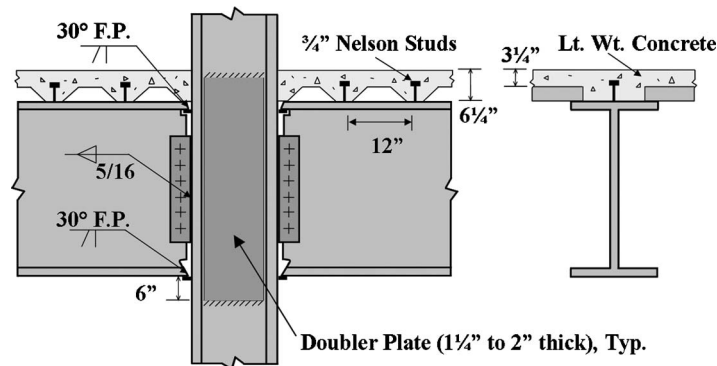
Typical moment-resisting connection details for a girder to column flange.
